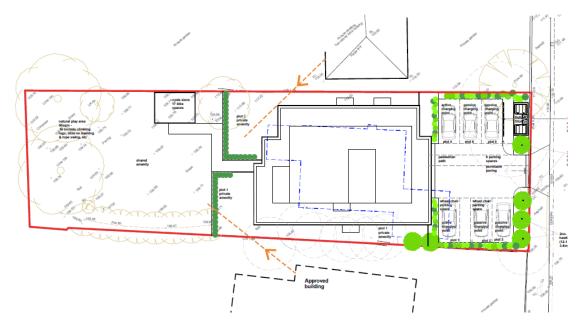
Proposed Block Plan with 1a and 3a West Hill
